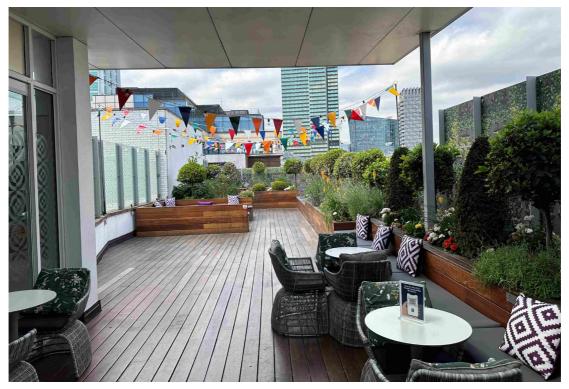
View of the existing roof terrace with current timber decking, planters and seating, looking west, *CBP*.
